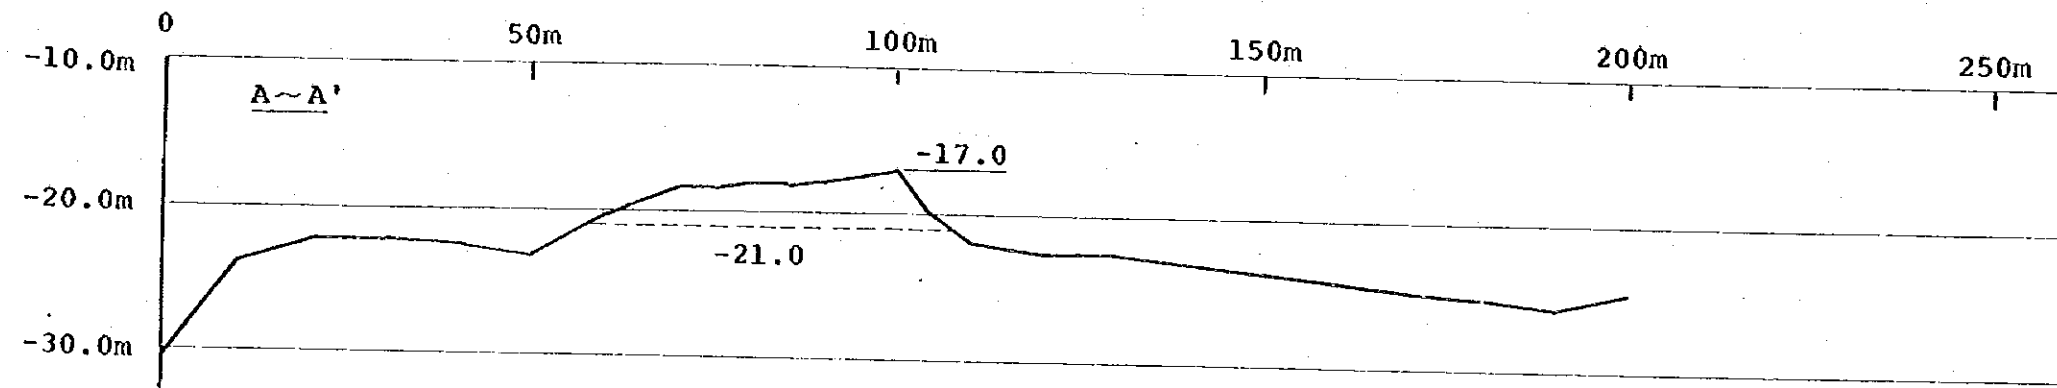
Typical Cross-Section of Shoal-D
